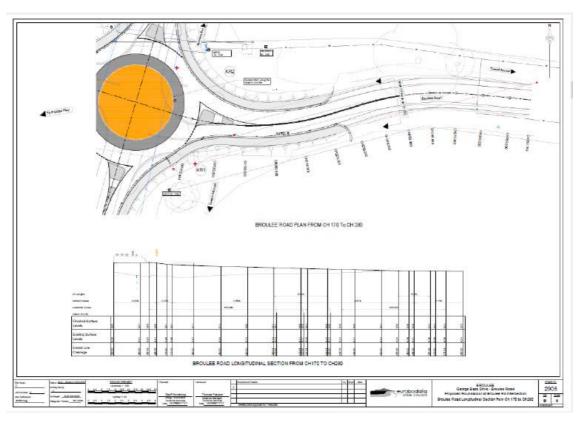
Plan of roundabout showing scope of works for Broulee Road (East).
